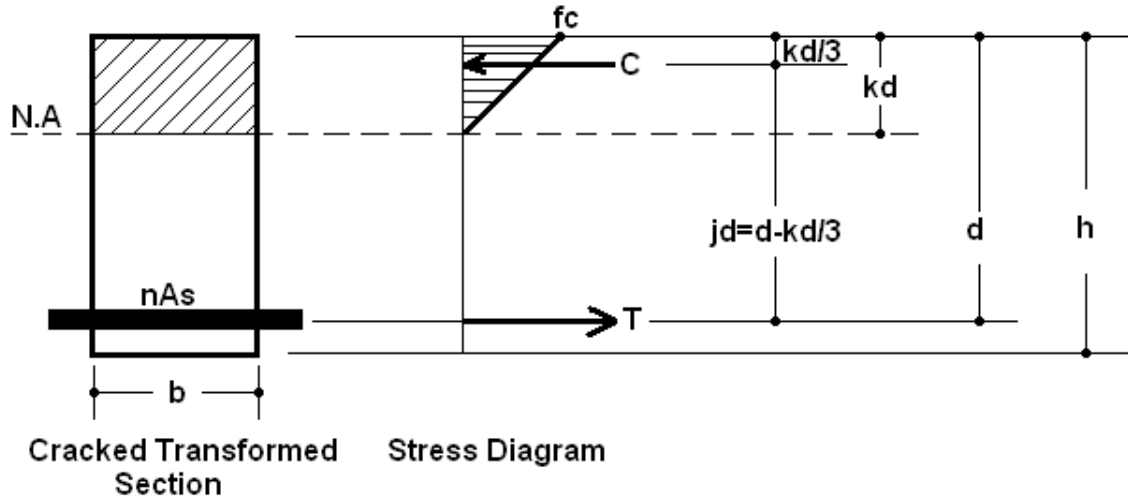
Notations of WSDM in a Reinforced Concrete Section
